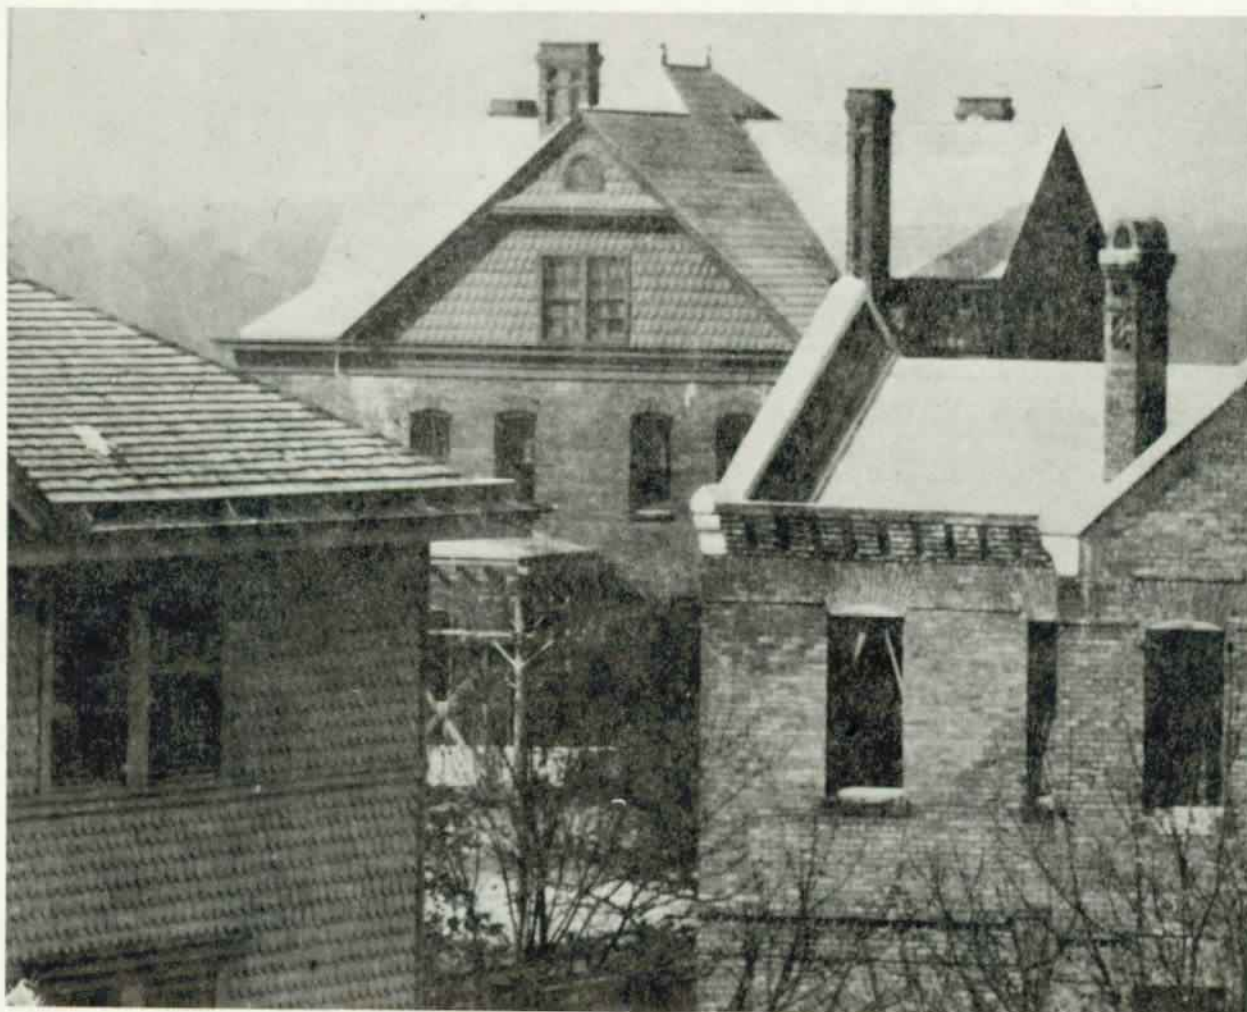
From Overall View of Tuskegee Campus, 1902. Note the Oaks with the dining room addition under construction. (Frances Benjamin Johnston Collection, Library of Congress)
